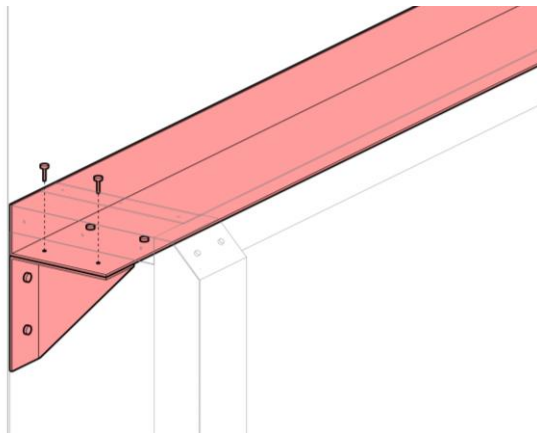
Image revealing structural elements at the corners of the facade module, consisting of an L-beam within the prefabricated module, resting on a steel mounting bracket.
